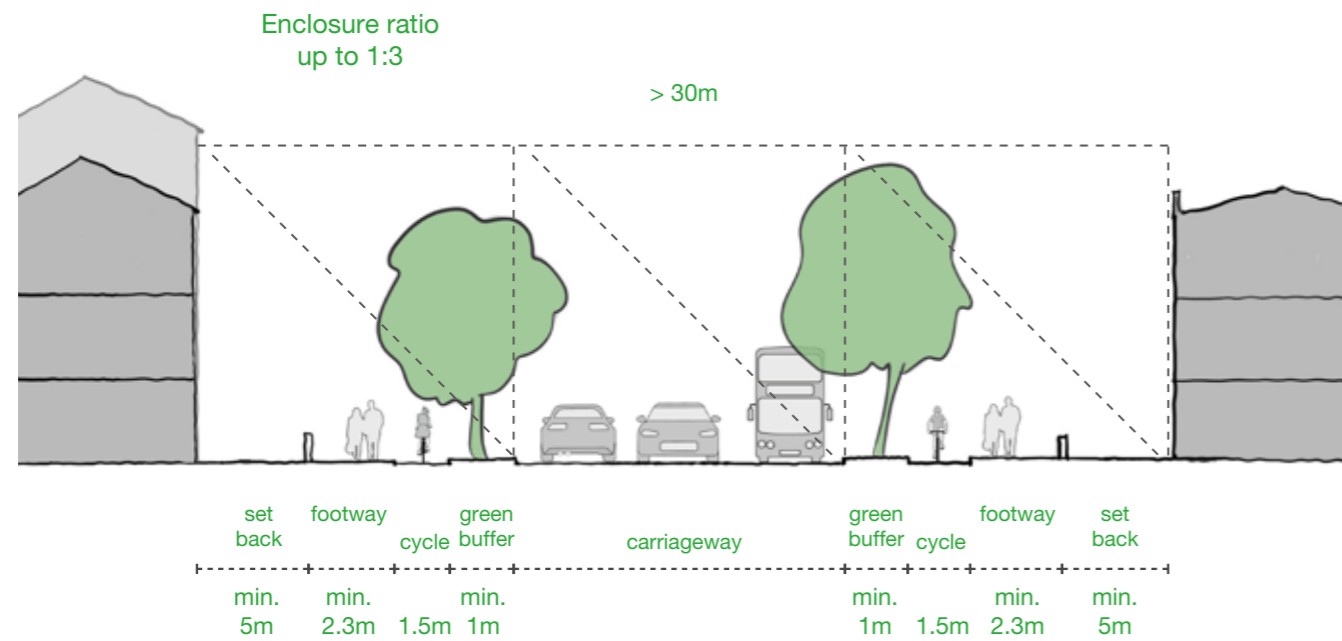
Typical street section of primary traffic street in Lichfield City Centre area
